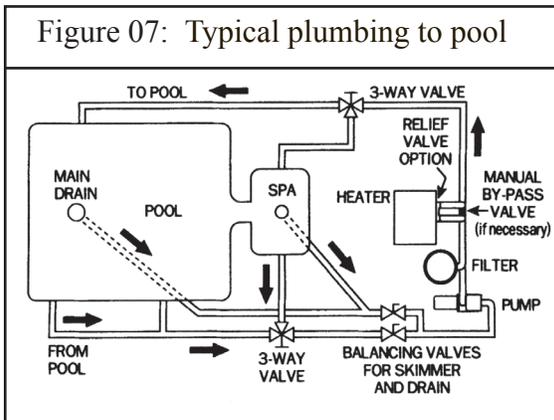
illustrates a typical pool piping diagram and layout for the pool equipment.
